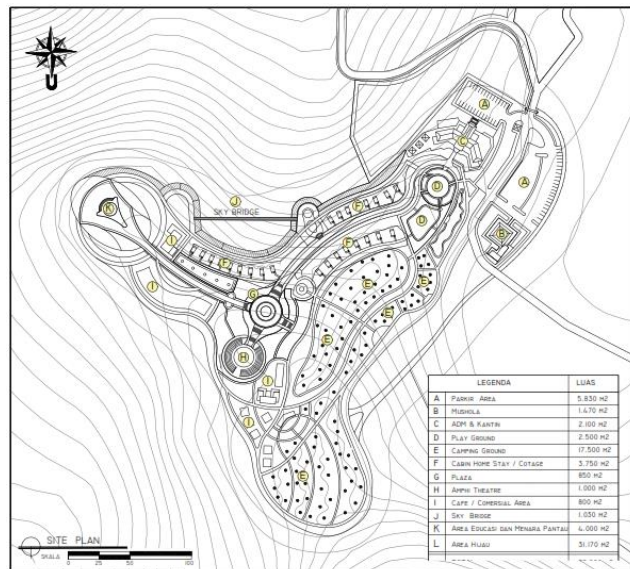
Site Plan Master Plan of Mount Sangabuana Area
